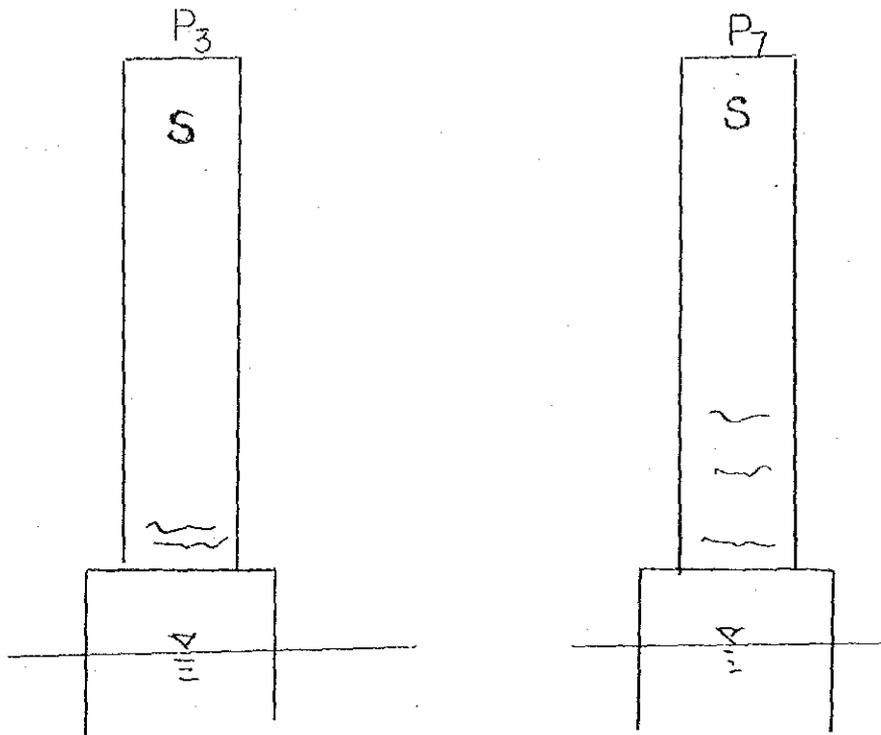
Location of Cracks at Pier No.4
